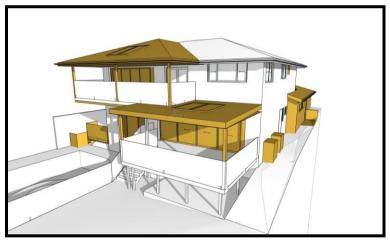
Proposed works at No. 5 The Crest. (Action Plans 2019).
